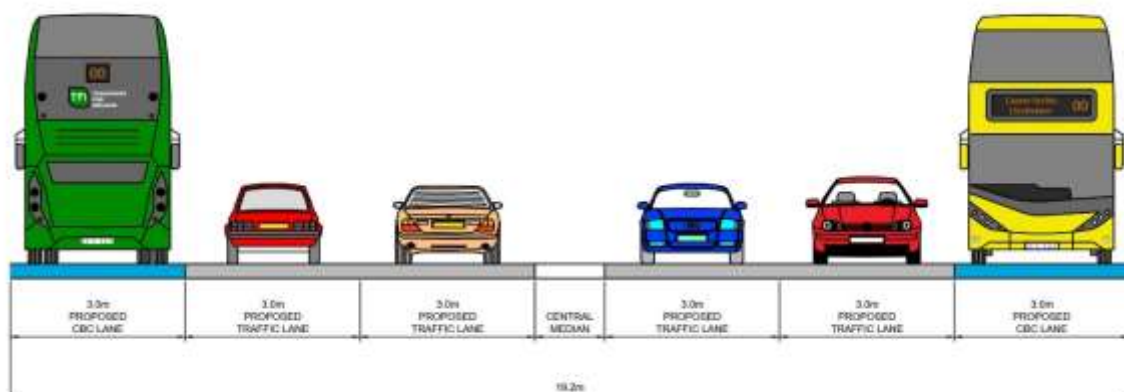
Typical National Primary Road Cross Section (A-A)
